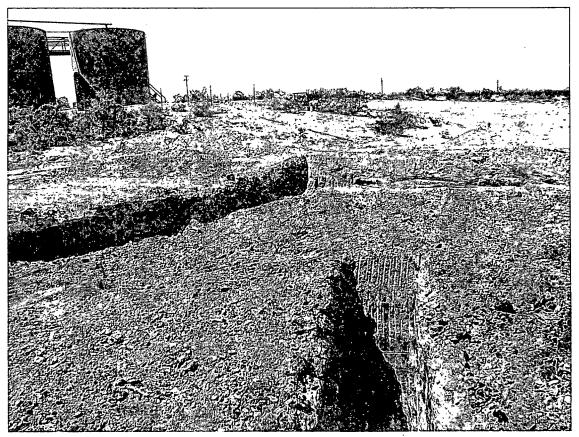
mil polyurethane liner cap and layer of top soil installed on top of historic drilling reserve pit. (Looking Southeast)
